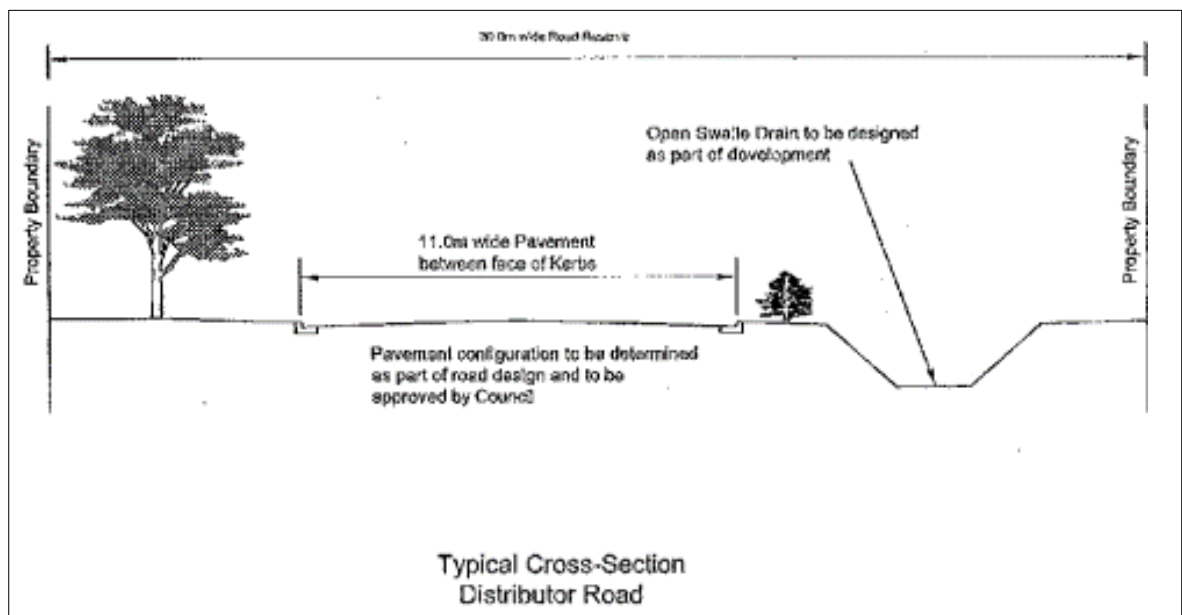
Typical cross-section distributor road as required by clause NOR-S1.8.1
